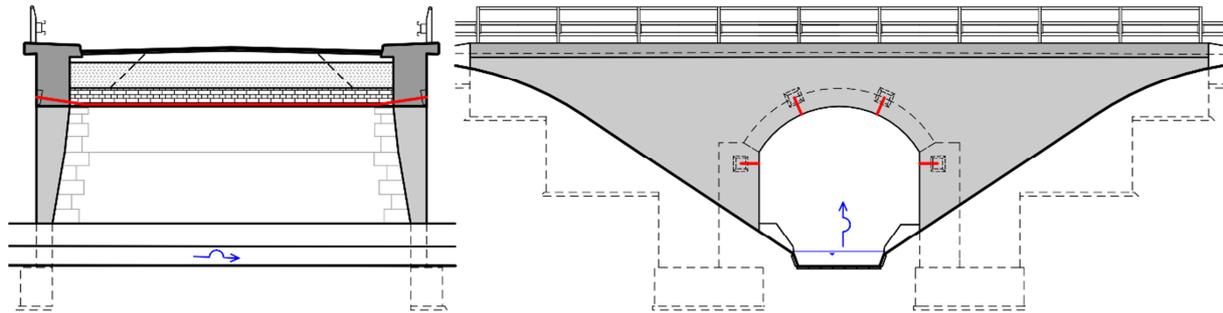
Plan of the structure measured during prestressing; left - cross section of the vault with cables; right - view of new face wall with anchorage ducts for four cables.
